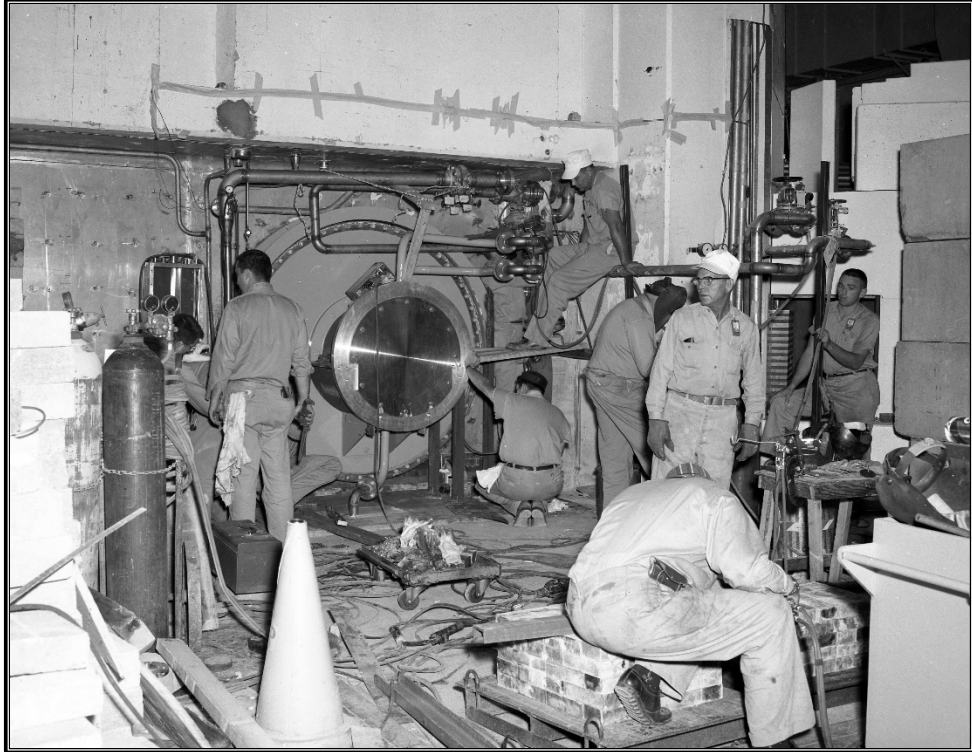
Archival photograph showing the installation of the GCR-ORR Loop No. 2 at the South Engineering Test Facility at the ORR in Building 3042, circa 1960 (ORNL Photo 51474).
